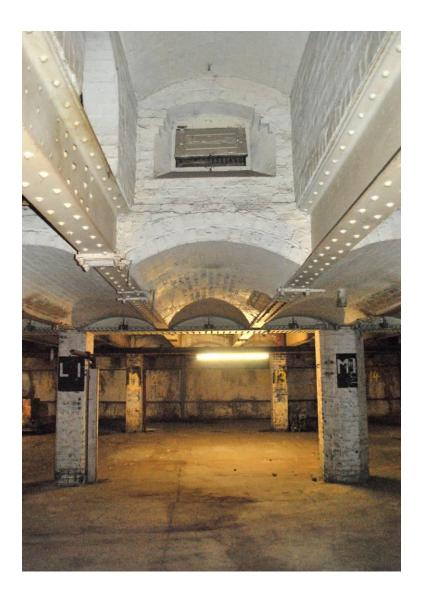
Raised ceiling on sleeper walls under a platform, with ventilation shutter in platform side. View from W.
